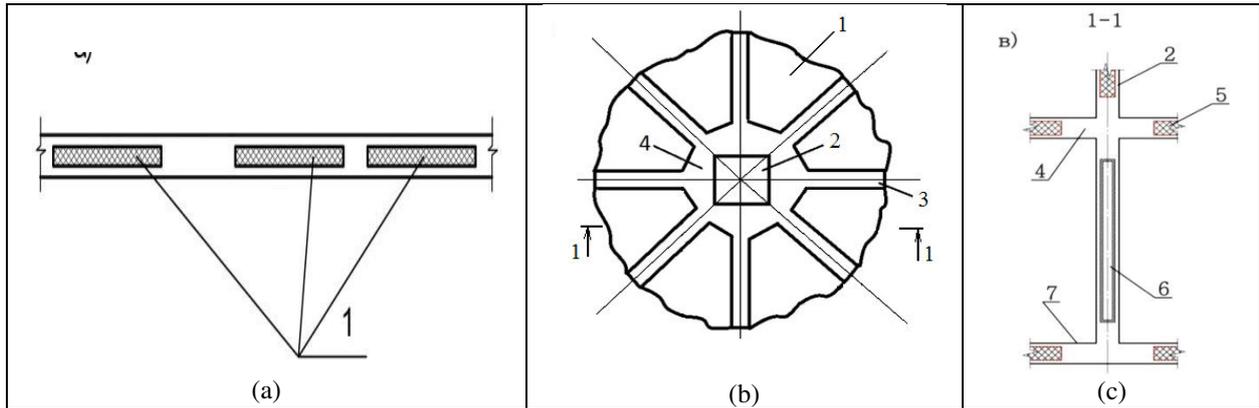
Constructions with liners: (a) floor slab; (b) capital (top shelf not shown); (c) liners in the building elements; 1 - liner; 2 - pillar; 3 - internal stiffeners of the slab; 4 - capital; 5, 6 - the liner with solid and box section; 7 - foundation.
